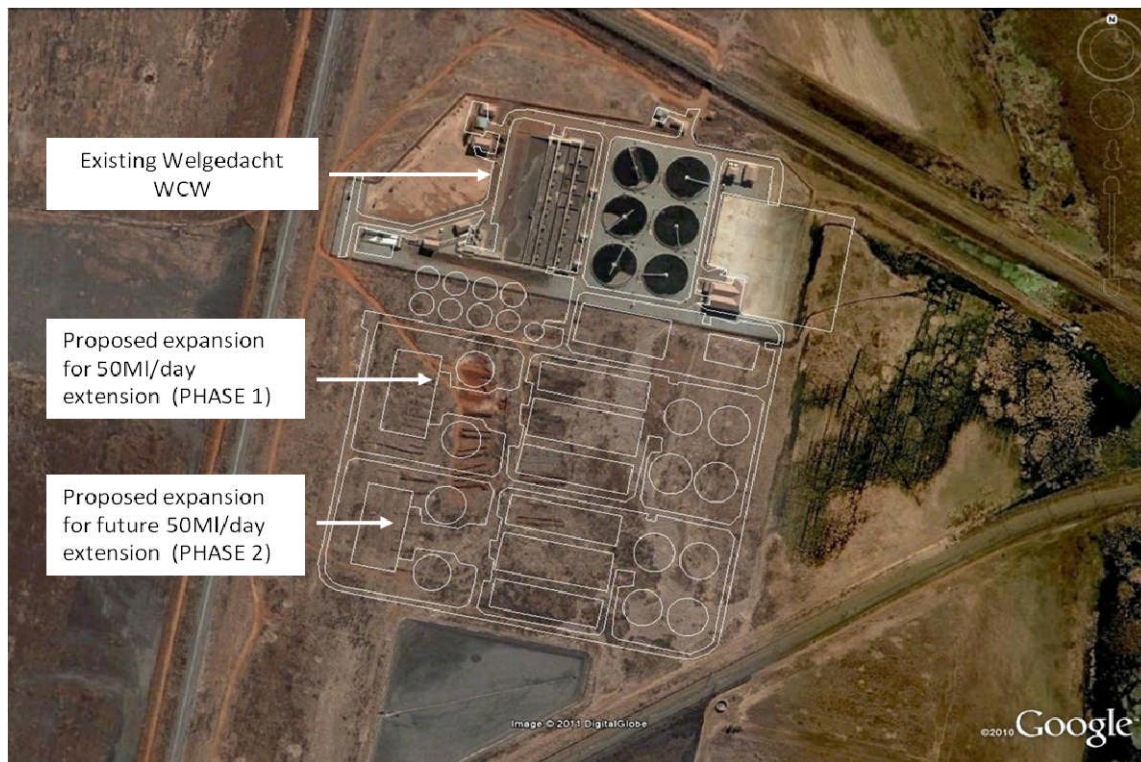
Layout of the proposed extension to the Welgedacht WCW
